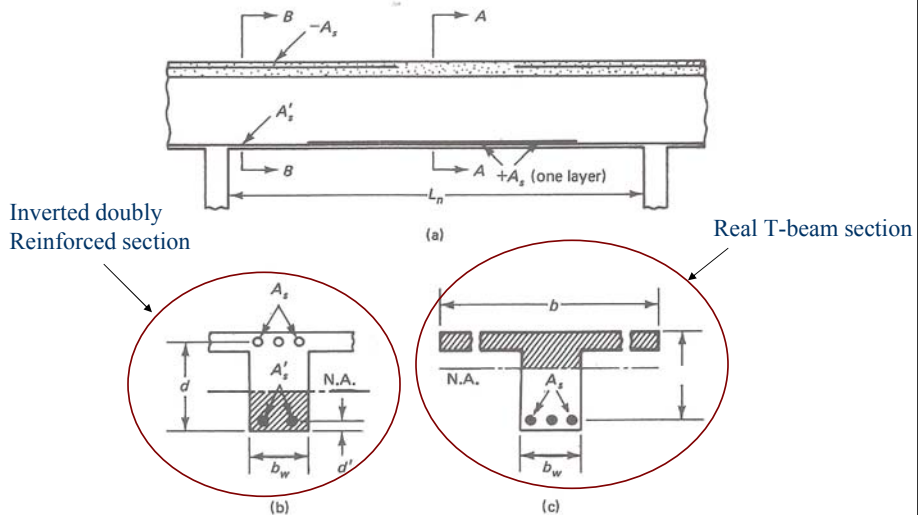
Elevation of monolithic beam: (a) beam elevation; (b) support section $B-B$ (inverted doubly reinforced beam; (c) midspan $A-A$ (real T-beam)
